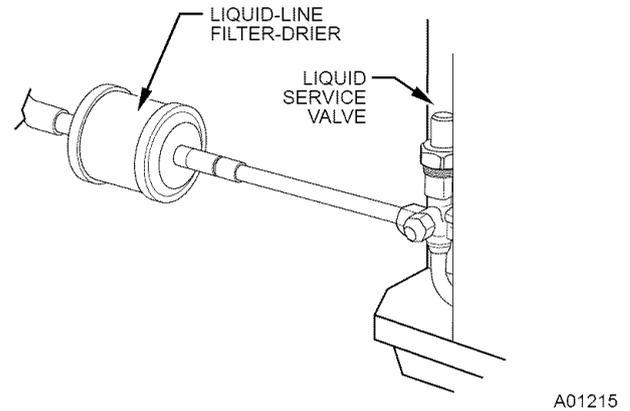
Filter Drier with Sweat Adapter Tube and Liquid Tube
